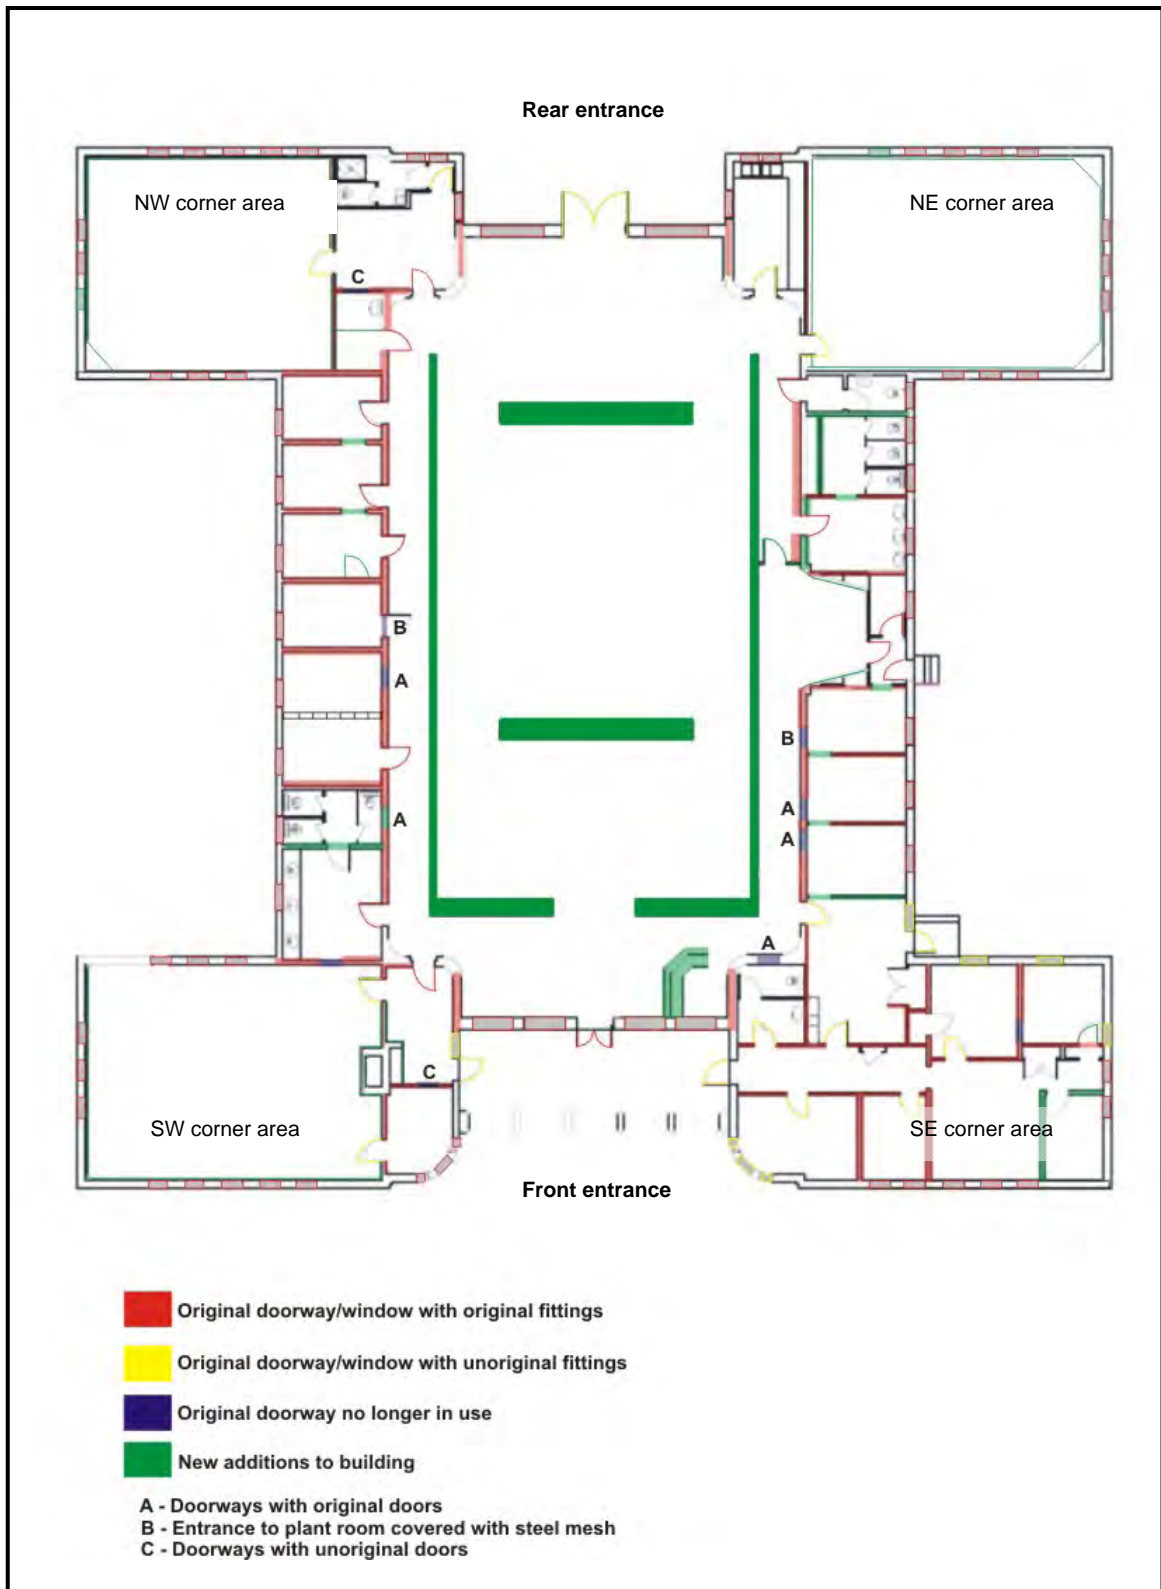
Floor plan of Drill Hall Gallery showing major aspects and specific details of fittings (ANU Heritage Office)
